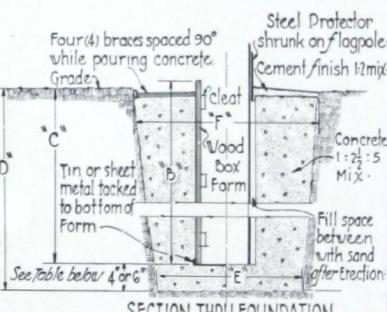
DETAILS & INSTRUCTIONS for BUILDING CONCRETE FOUNDATIONS for "LINGO" SWAGED SECTIONAL FLAGPOLES
